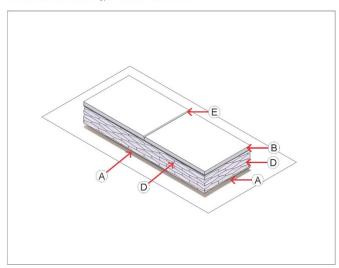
Seat wall type 1 axonometric view - flat end
